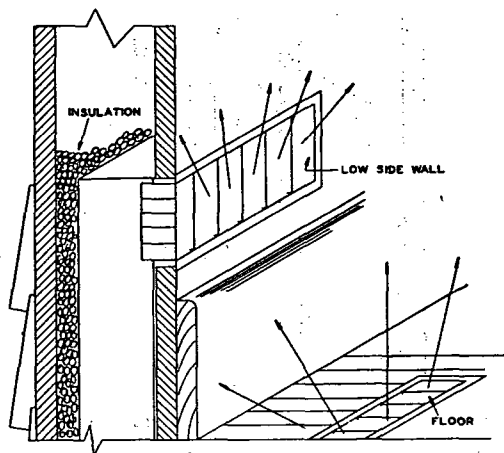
RECOMMENDED TYPE OF FLOOR OR LOW SIDEWALL INSTALLATION ON OUTSIDE WALL
